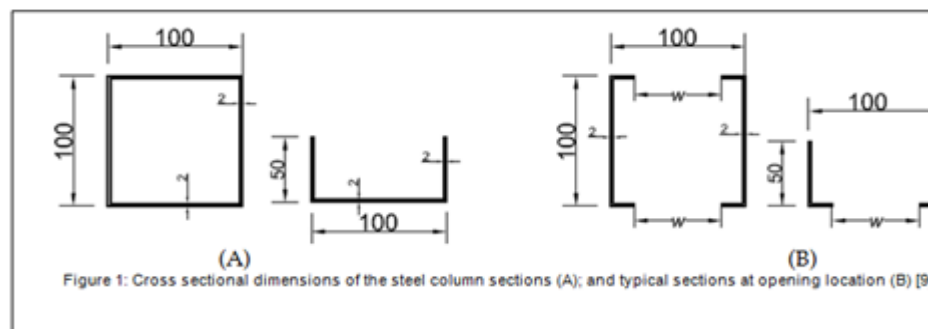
Cross sectional dimensions of the steel column sections (A); and typical sections at opening location (B) [9]
